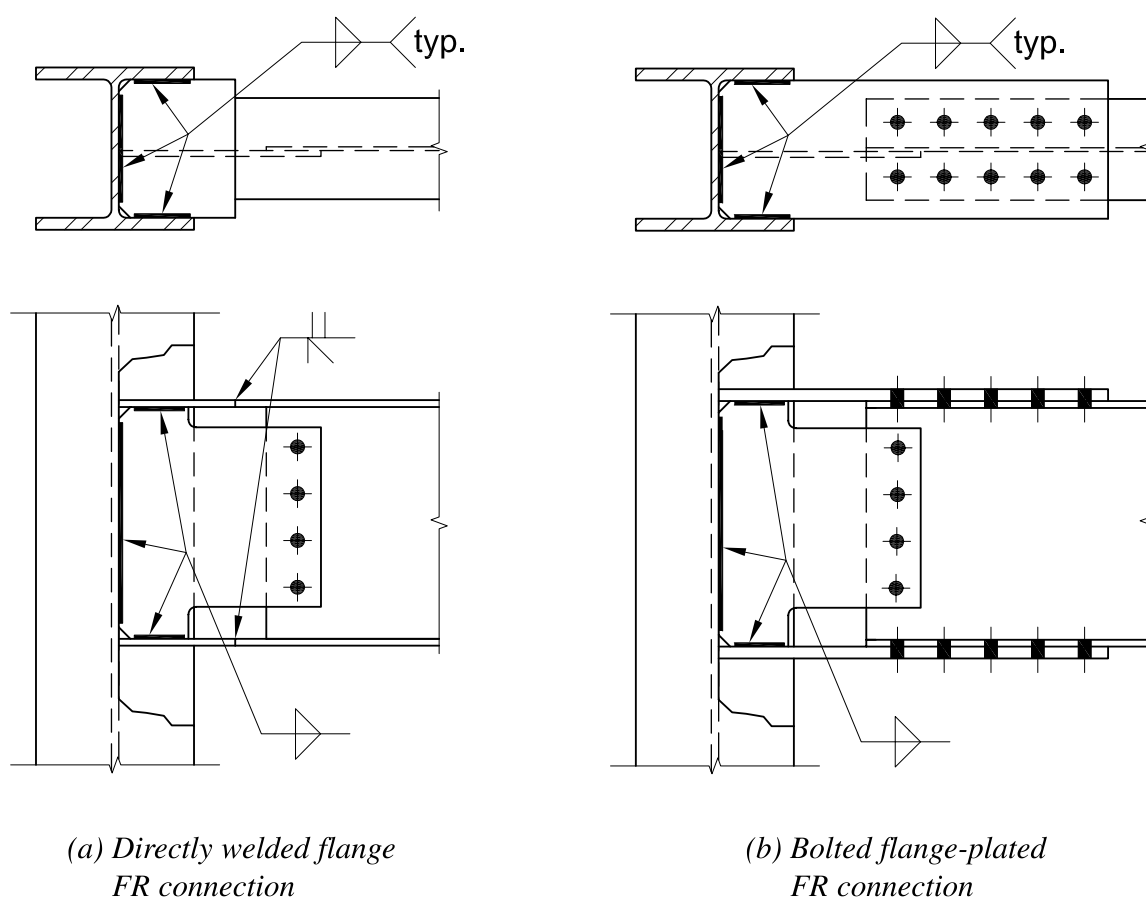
Test specimens used by Driscoll and Beedle (1982).
